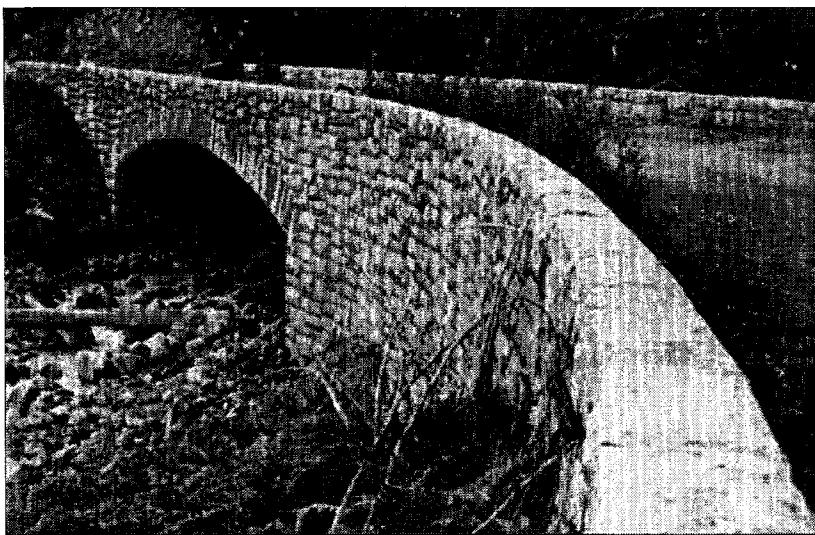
Historic photo showing Stevens Canyon Bridge with revegetating bridge deck, after period of neglect during WWII, 1952 (MORA Archive).
